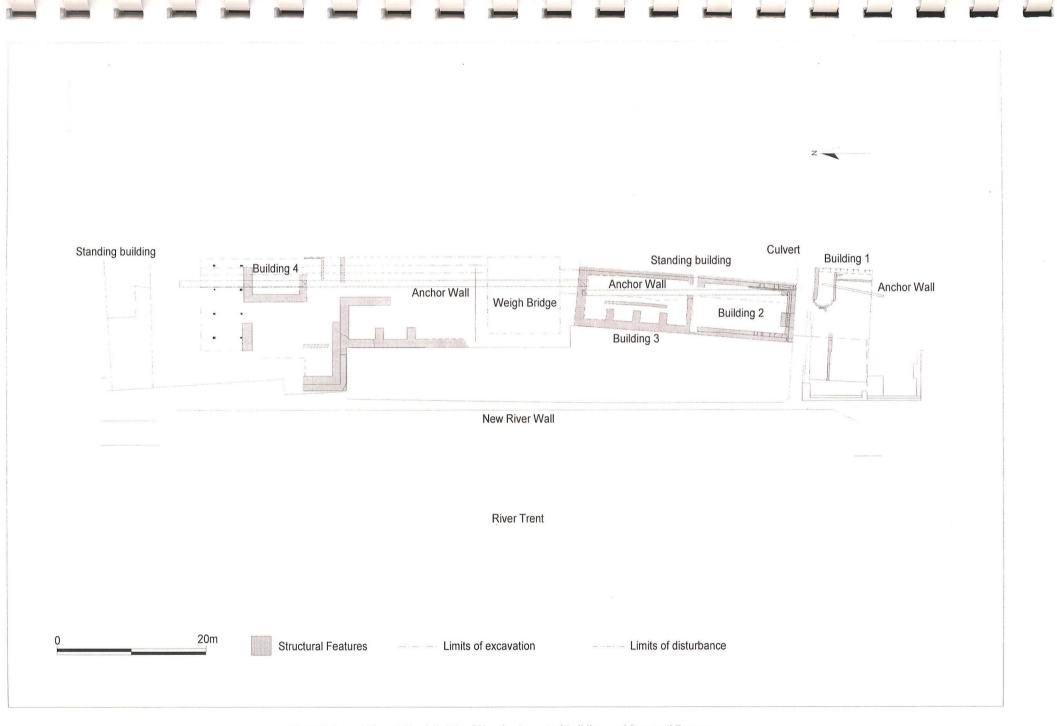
General Plan of Gleadalls Wharf Showing Layout of Buildings and Structural Features
